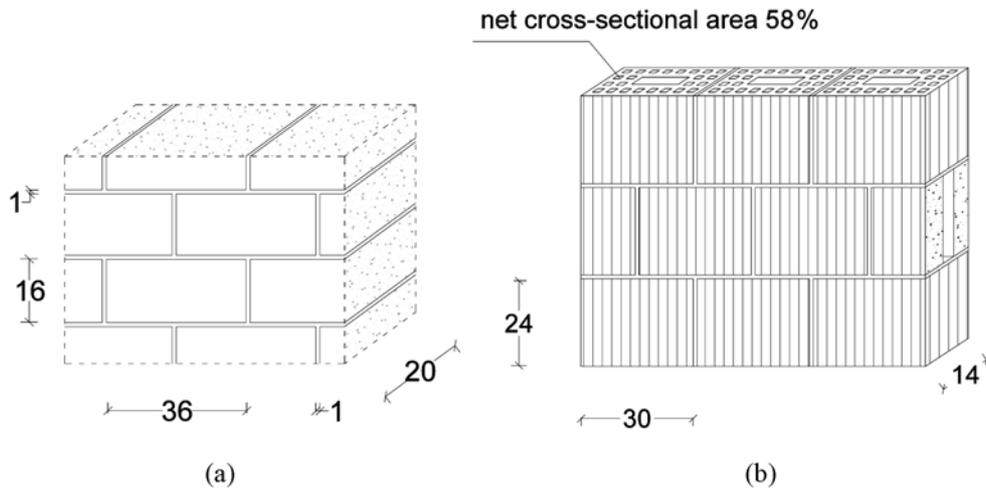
Masonry used for the infills (a) calcarenite block masonry, (b) hollow clay tile masonry
